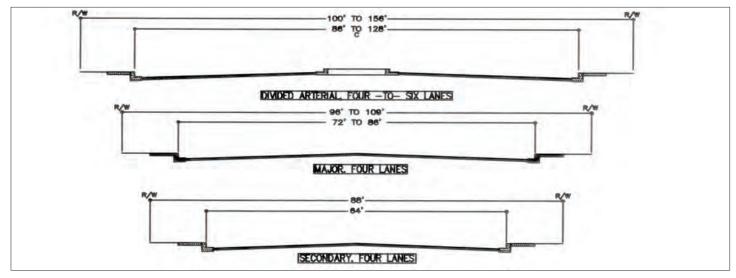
GENERAL PLAN TYPICAL CROSS SECTIONS
